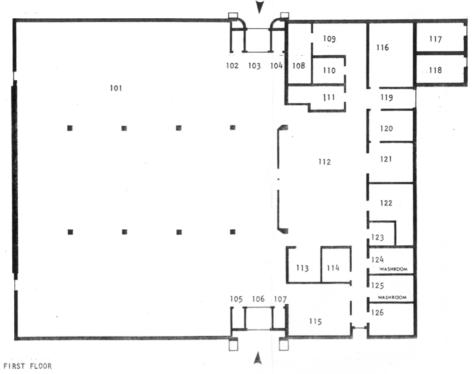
Building 1090 plan. (Courtesy DND, 2005)
